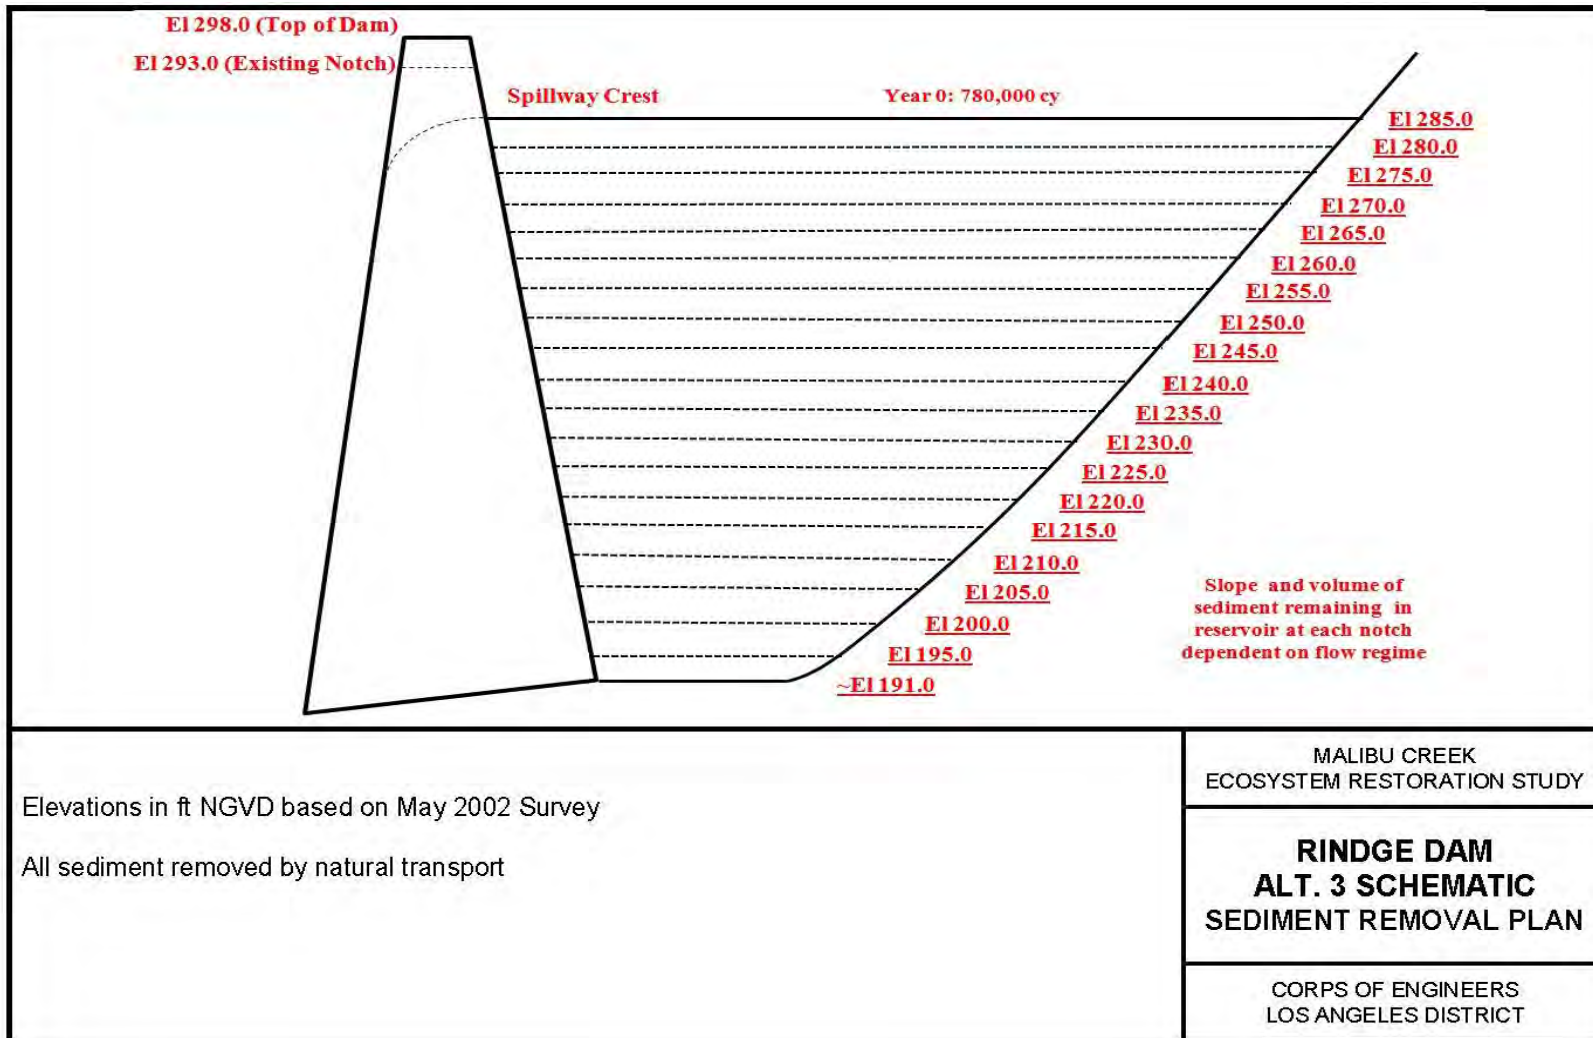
Rindge Dam - Alt. 3 Schematic, Sediment Removal Plan
